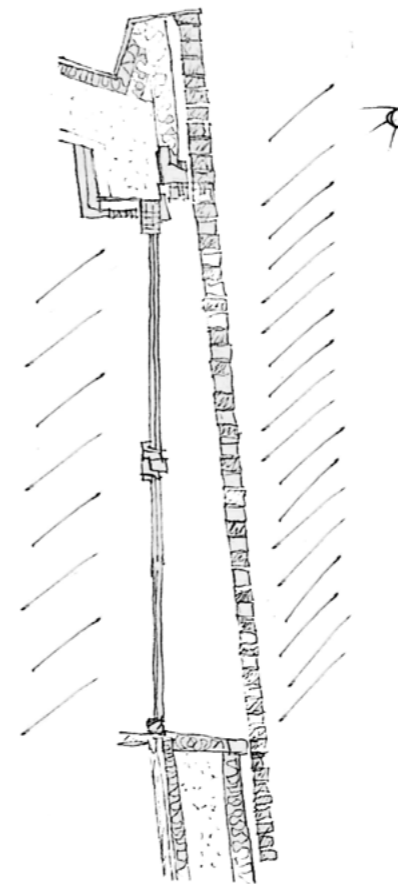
Author's sketch, window and perforated facade section, illustration of the light filtering
